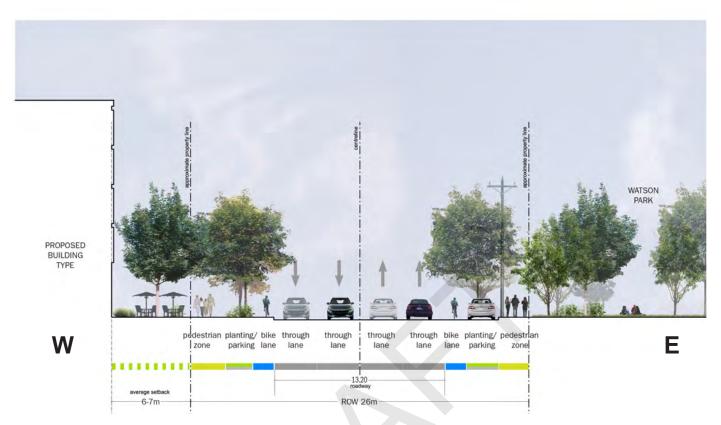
Cross-section facing Watson Park at Brock Street South
